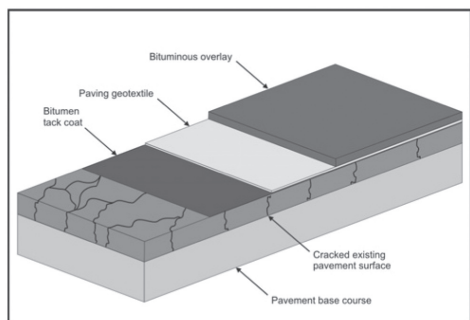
The use of paving geotextile associated with bituminous overlay to retard reflective cracking.
